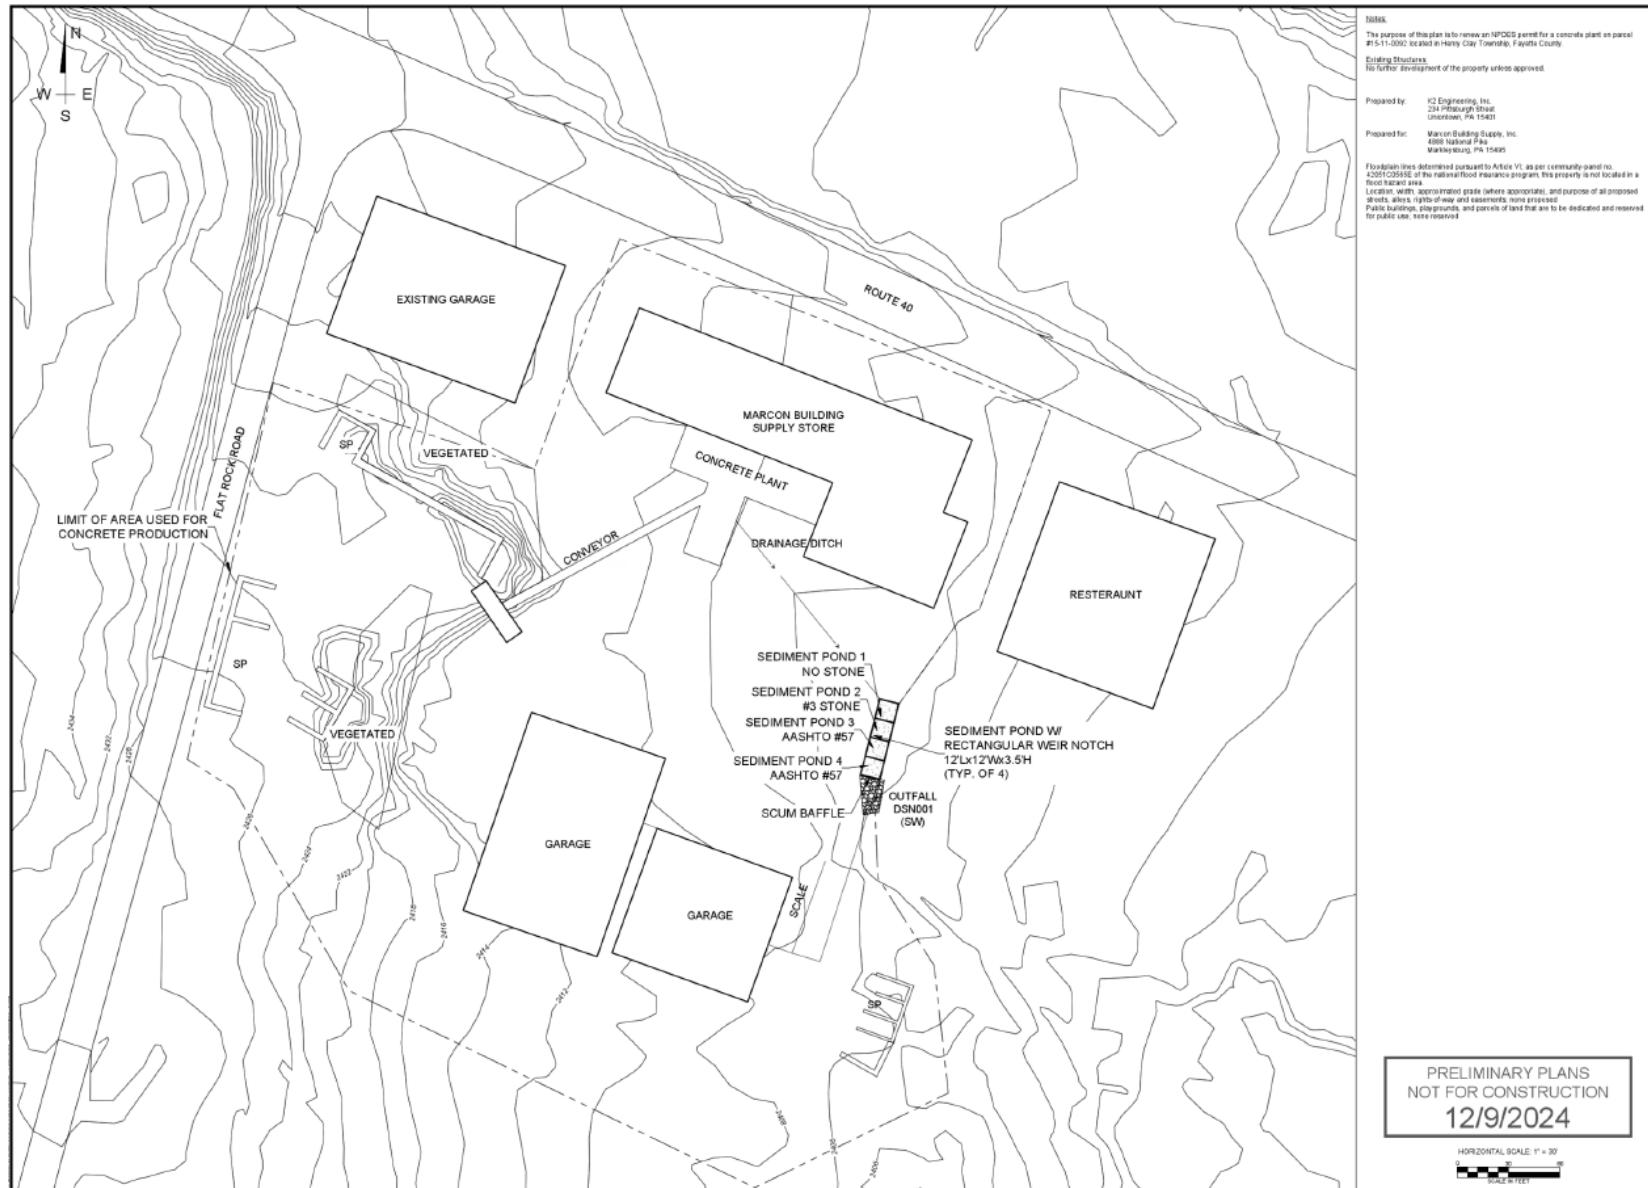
Layout of Marcon Building Supply, Inc. Markleysburg Facility
